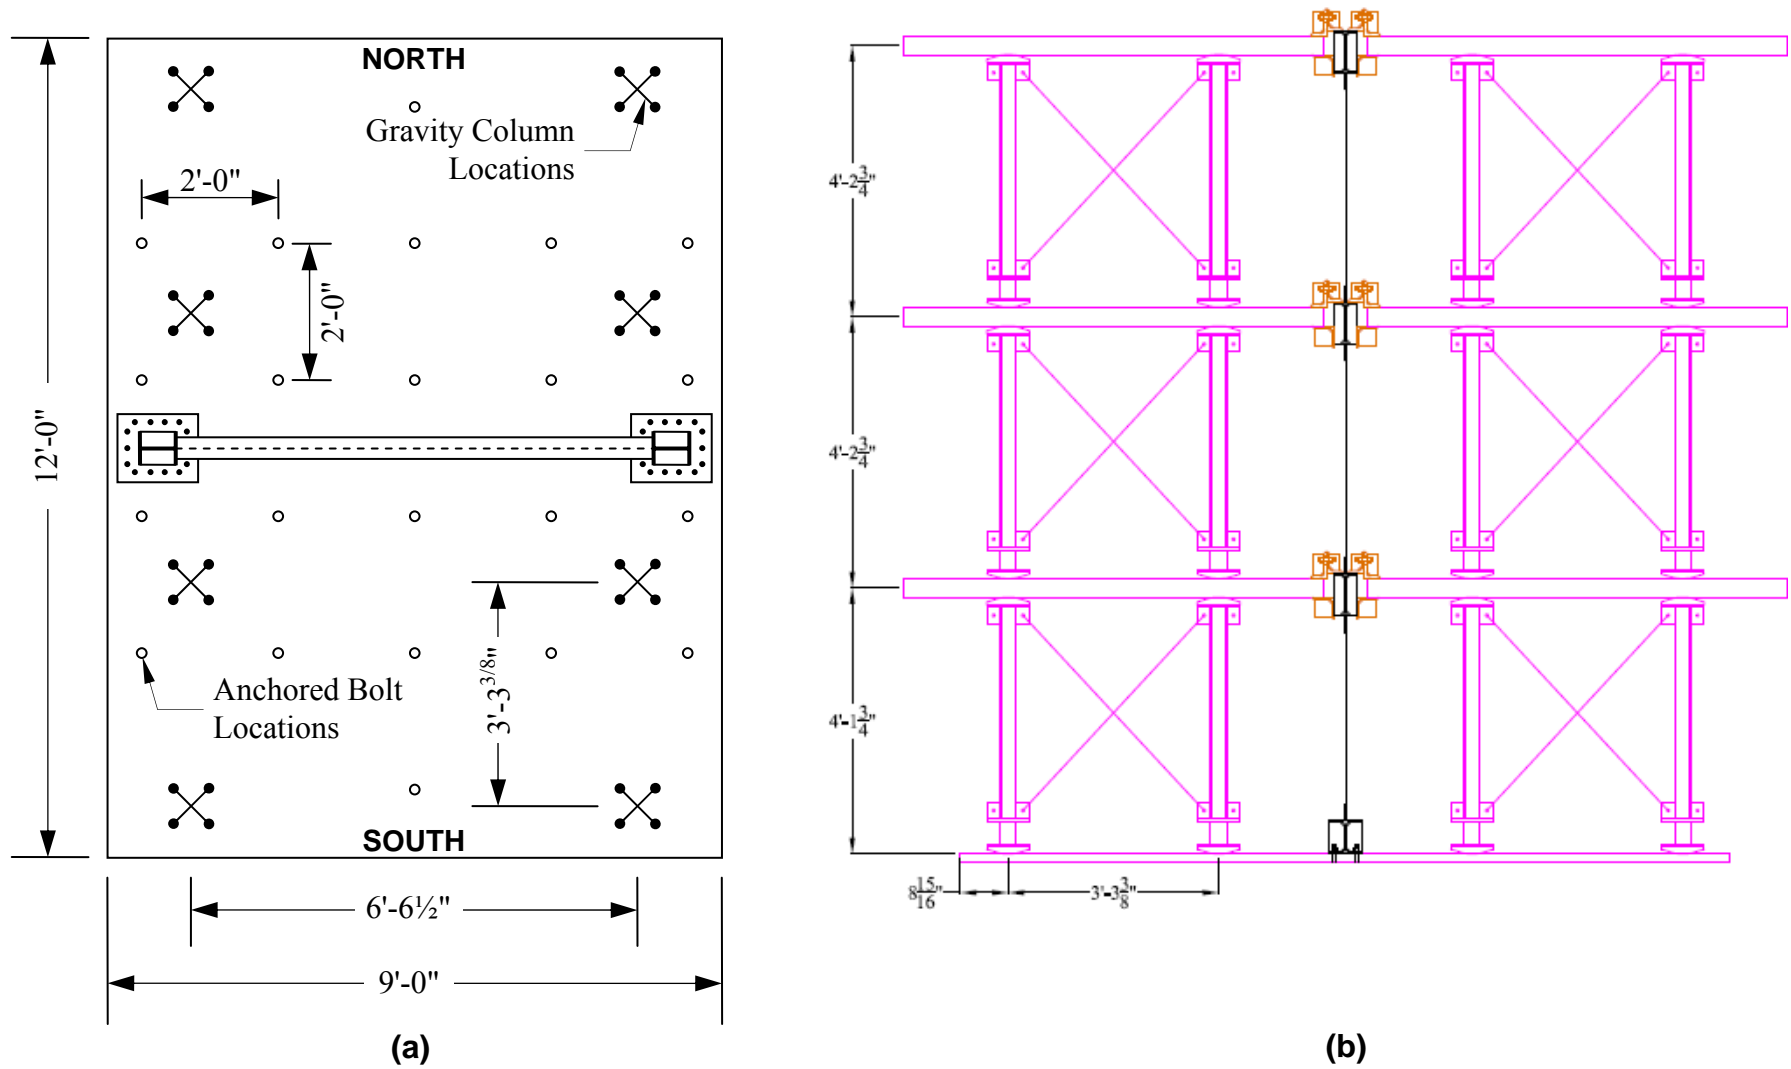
Schematic of Gravity Column System and Lateral Supports: (a) Floor Plate Plan; (b) North-South Elevation (Courtesy of Daniel Dowden)
